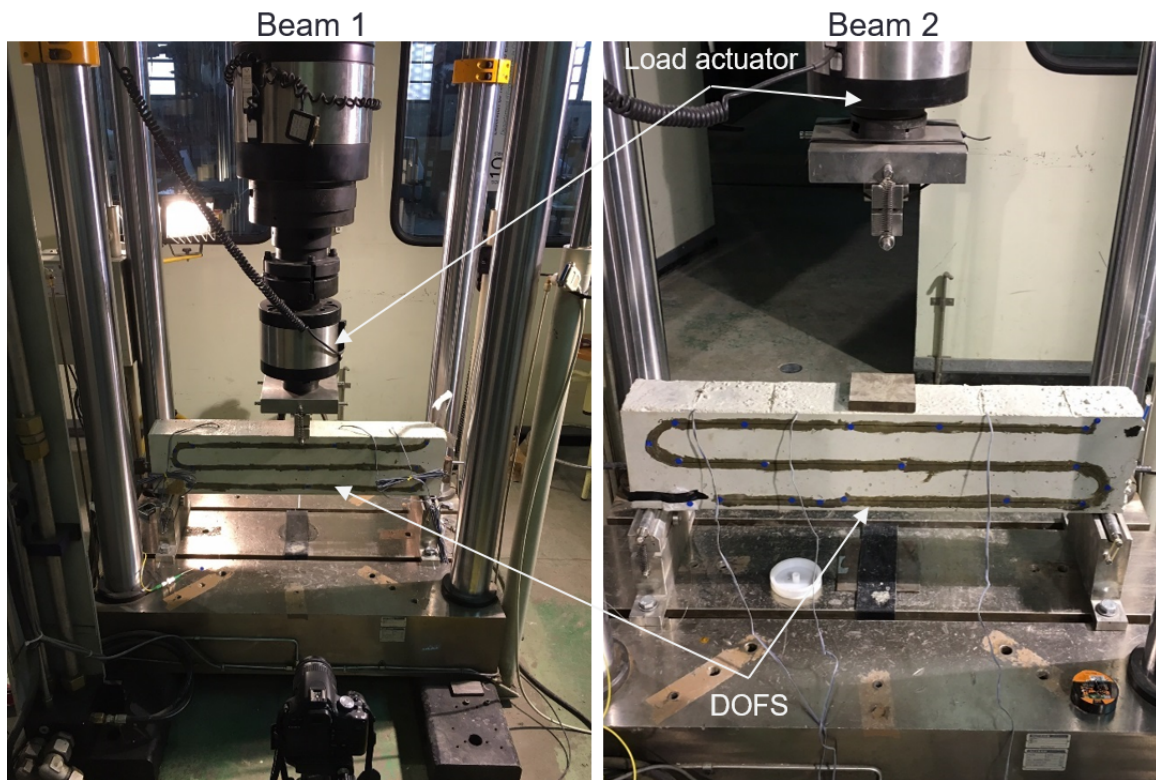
Reinforced concrete beam specimen 1 (left) and 2 (right).
